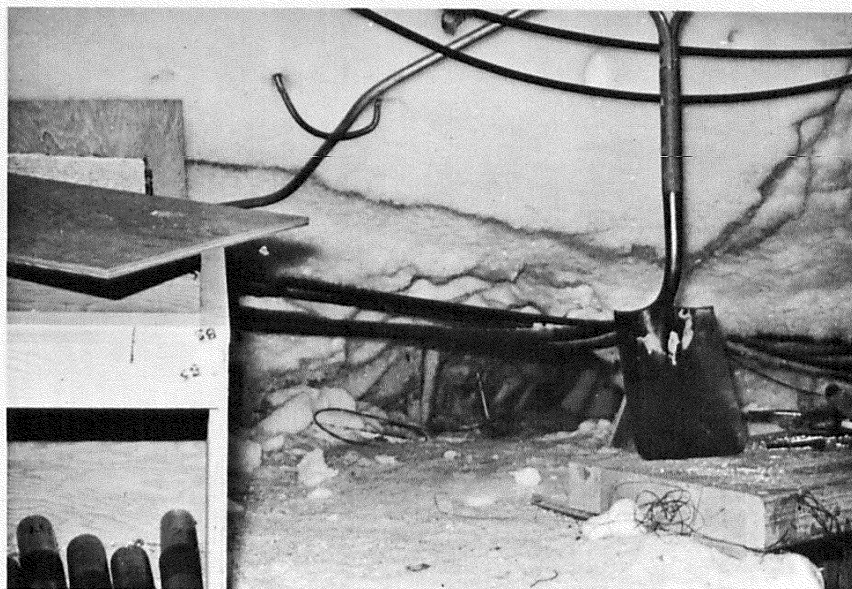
The floor and end wall panels of this plastic building known as the CRREL Lab were removed in 1966 to allow the removal of drilling equipment from the rear of Trench 12. The wall-roof panels later collapsed under excessive snow loading.
